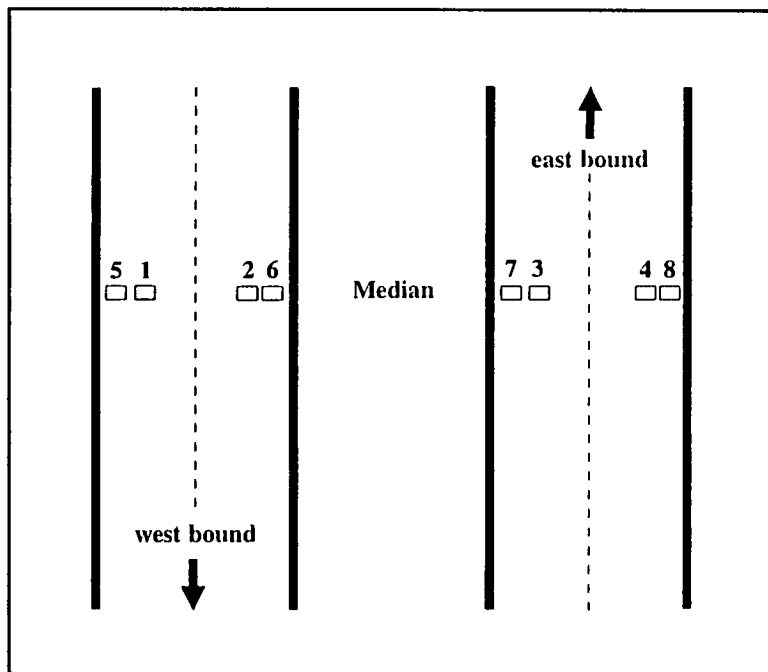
Sensor locations in the Mn/ROAD pavement
